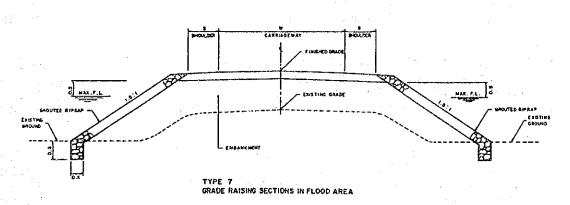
TYPICAL ROAD SECTIONS (6)
